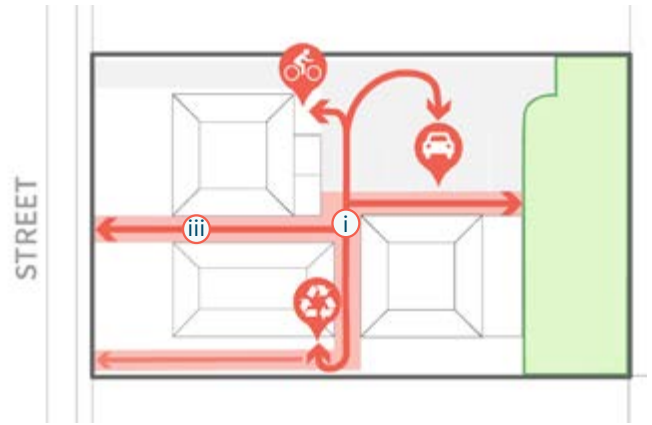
The pedestrian layout should allow for legible and safe movement between dwellings, on-site amenities the street and the wider active travel network.
